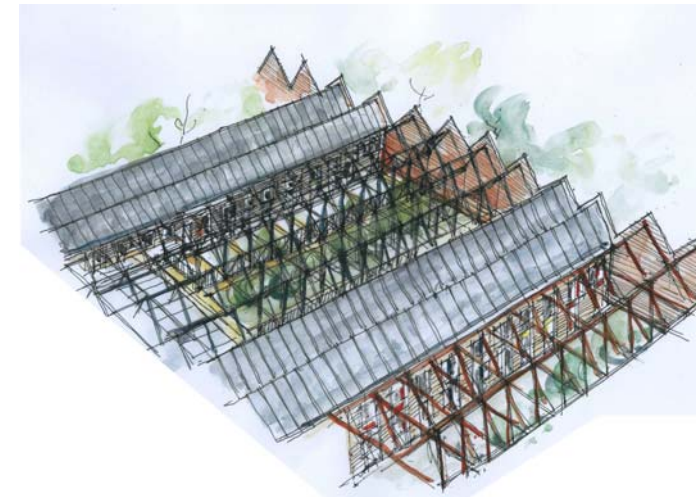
Visualisation of a proposed residential scheme for Pagefield Mills and sheds in Wigan by architects Howard + Setton. Roof frame retained to opened courtyard spaces
